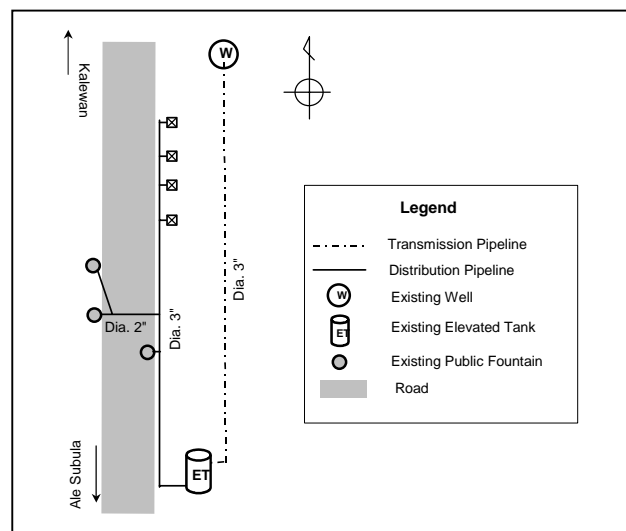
Layout of Existing Facilities of Derayitu
